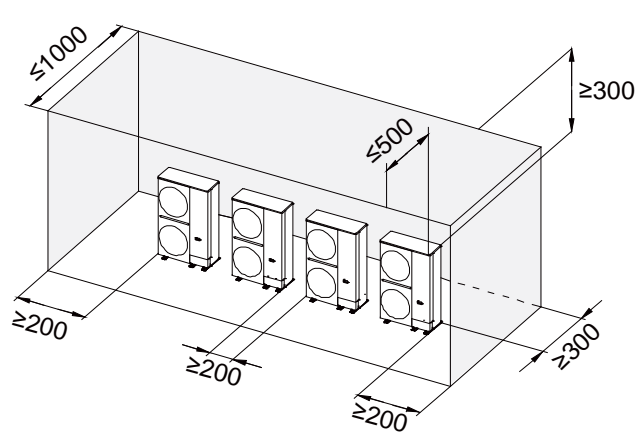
More than one outdoor unit installation (unit: mm)
